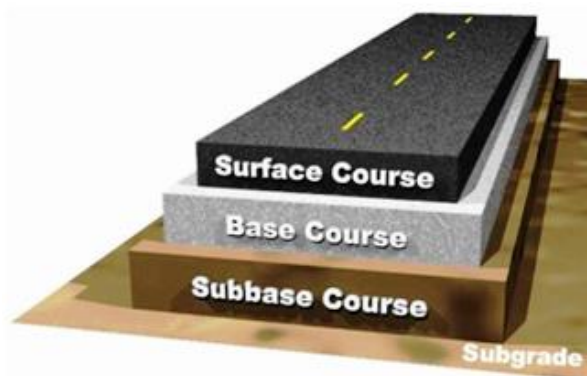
Conceptual sketch of a conventional pavement (after Zornberg)
